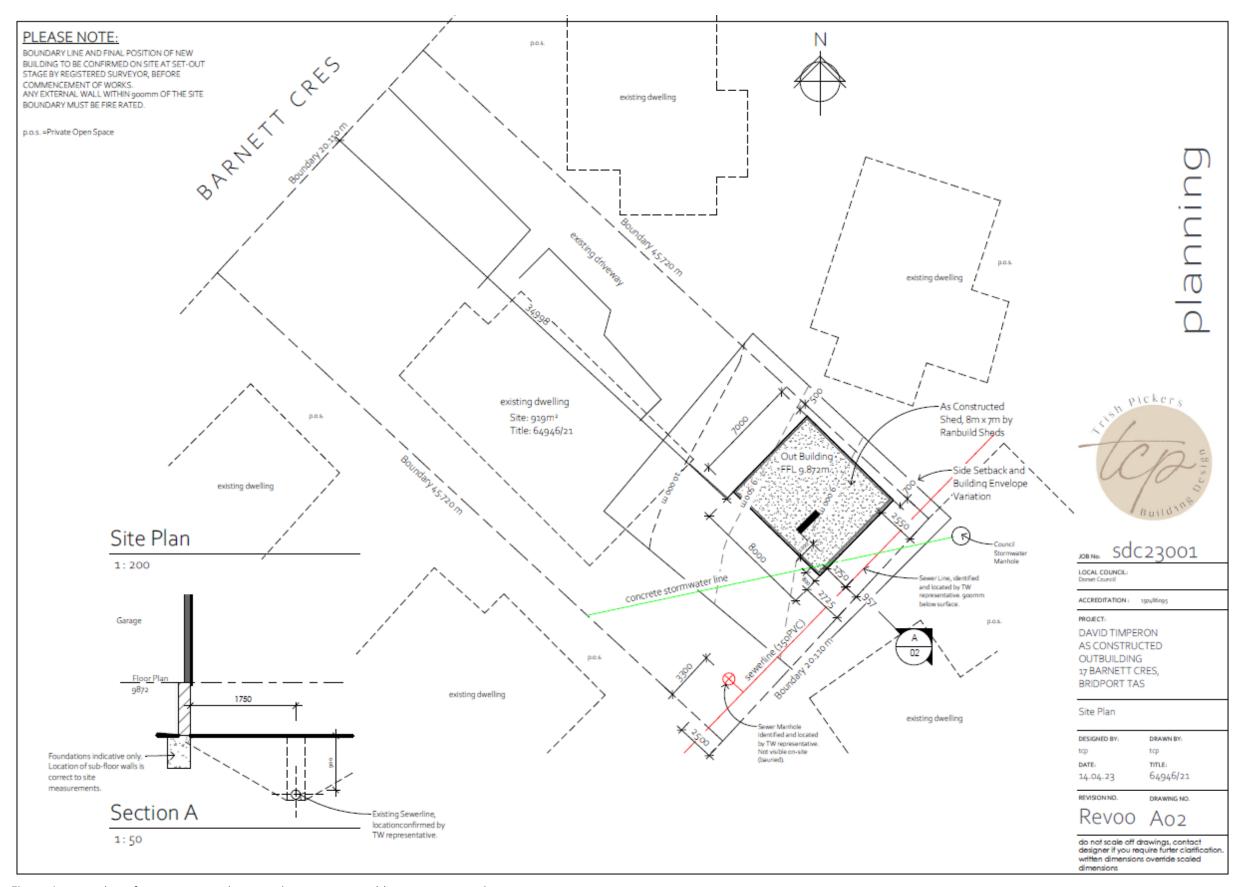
Site Plan of As-Constructed Garage (source: TCP Building Design, 2023)
